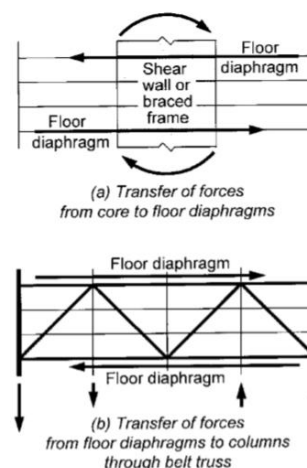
Force Transfer Using Belt Truss as Virtual Outrigger
